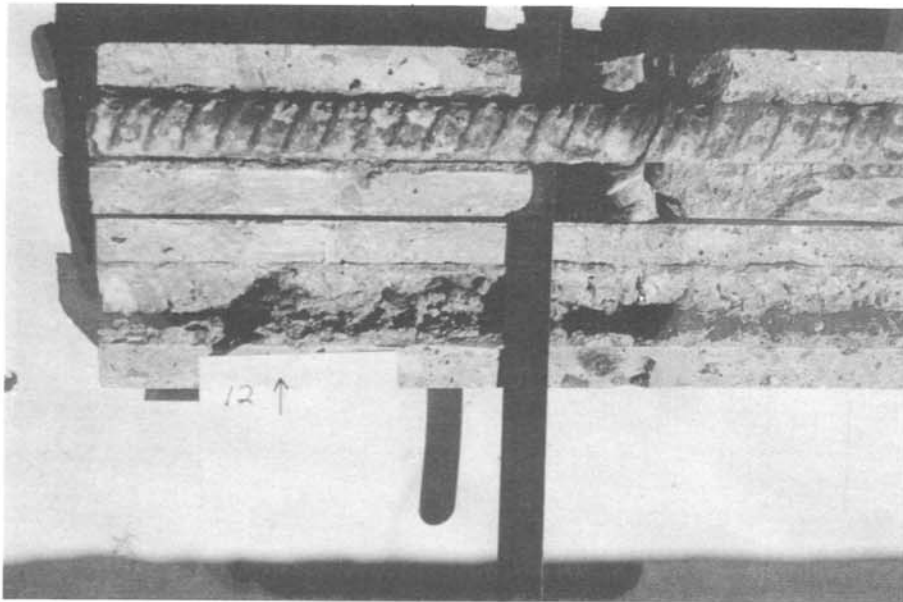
Slice of concrete containing the transverse reinforcement on Sample No. 12. Again note poor consolidation and active corrosion of reinforcement.
